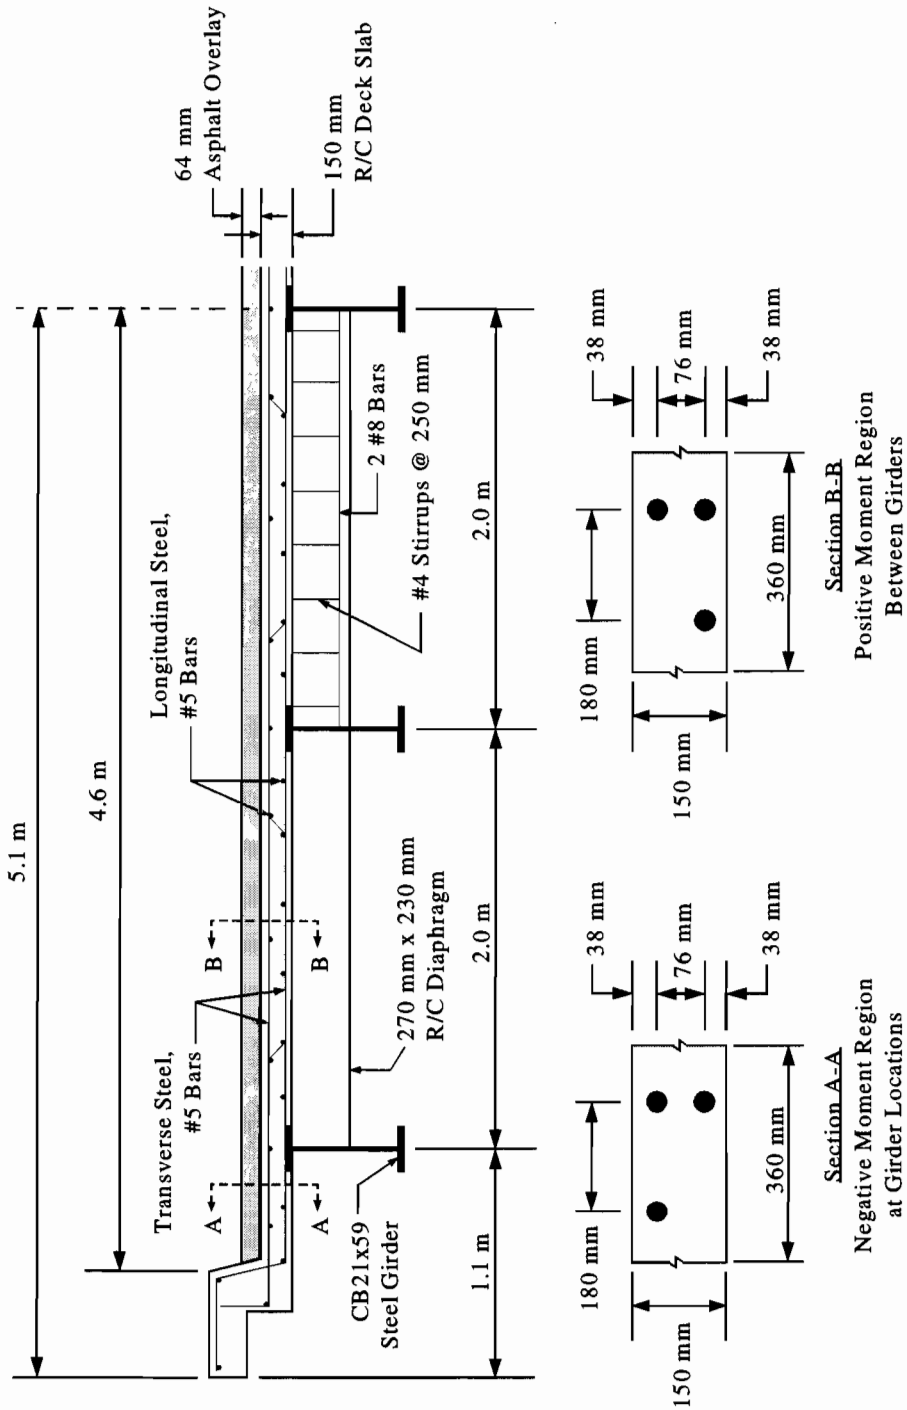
Cross Section of Superstructure and Deck Reinforcement.
